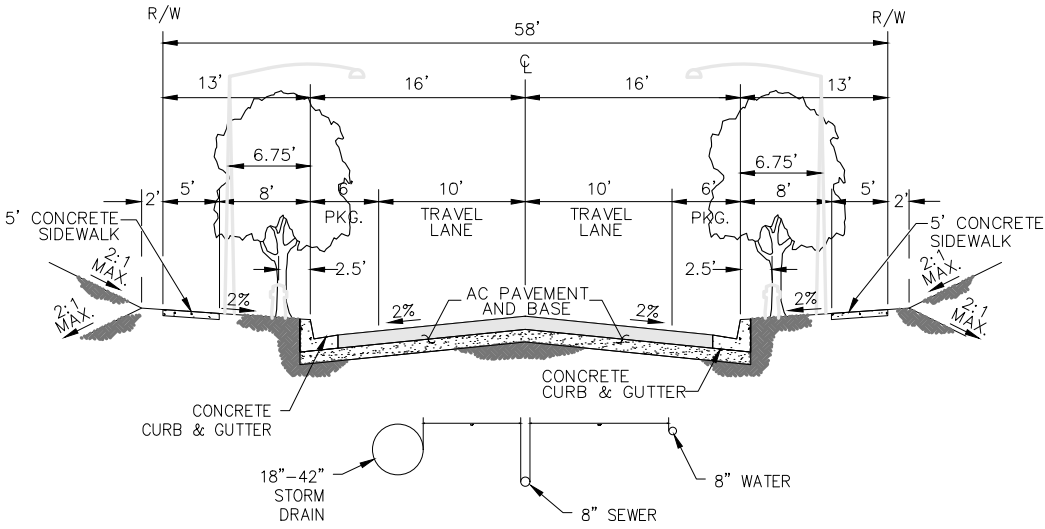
Parkway Residential (TM Street Section 11)
